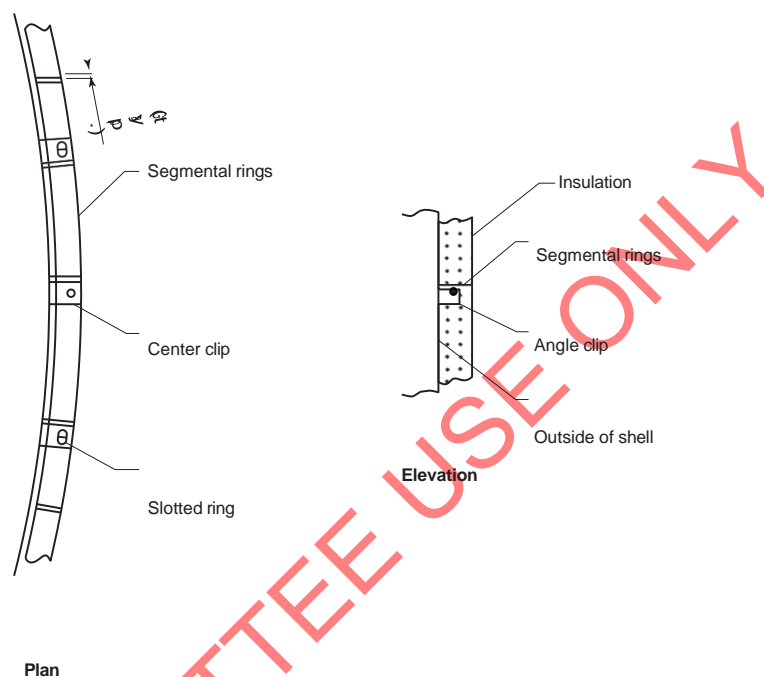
Insulation Support System with Clips Welded to the Shell With Segmented Rings Connected to the Clips by Bolts
